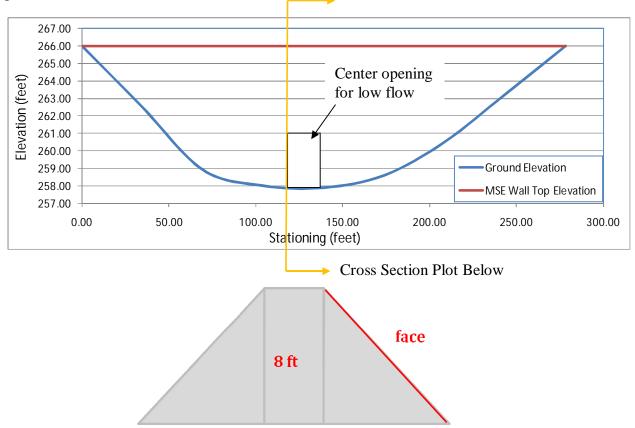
Face View of the MSE Wall and Cross Section of Proposed Detention Pond 1
